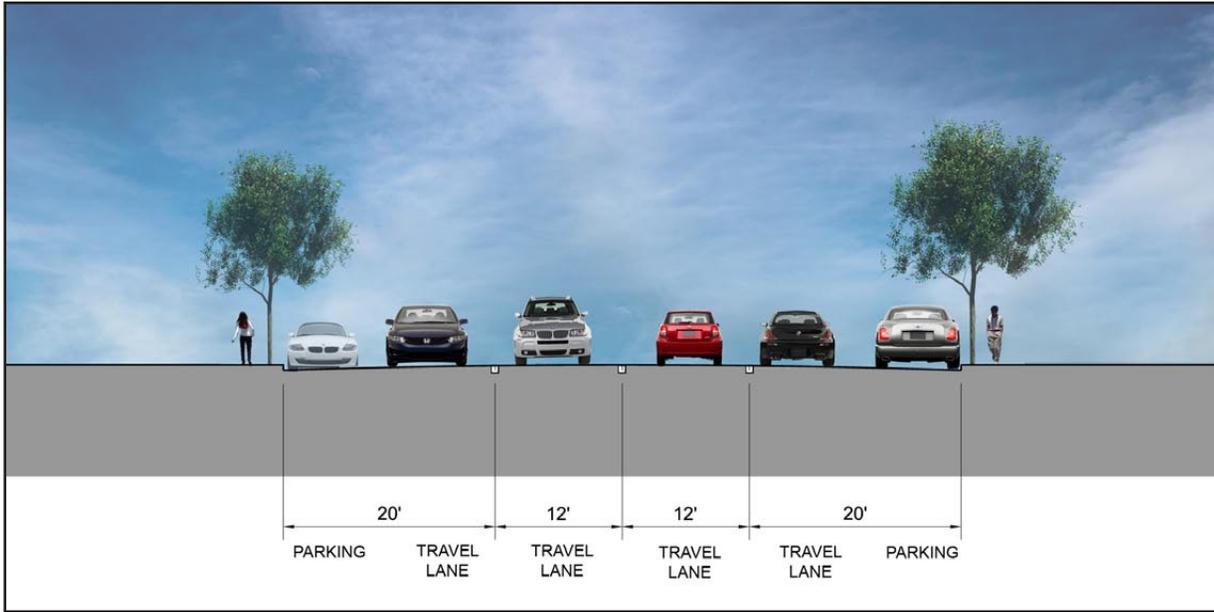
East Rush Street, from Tyler Avenue to Peck Road, facing south — Existing.
